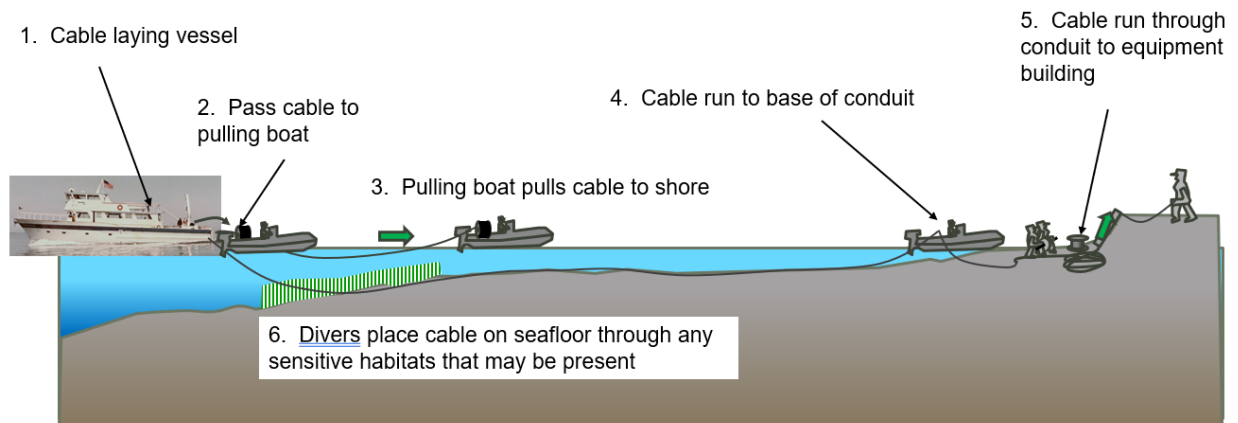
Example of Cable Laying Shoreside Landing Installation Plan
